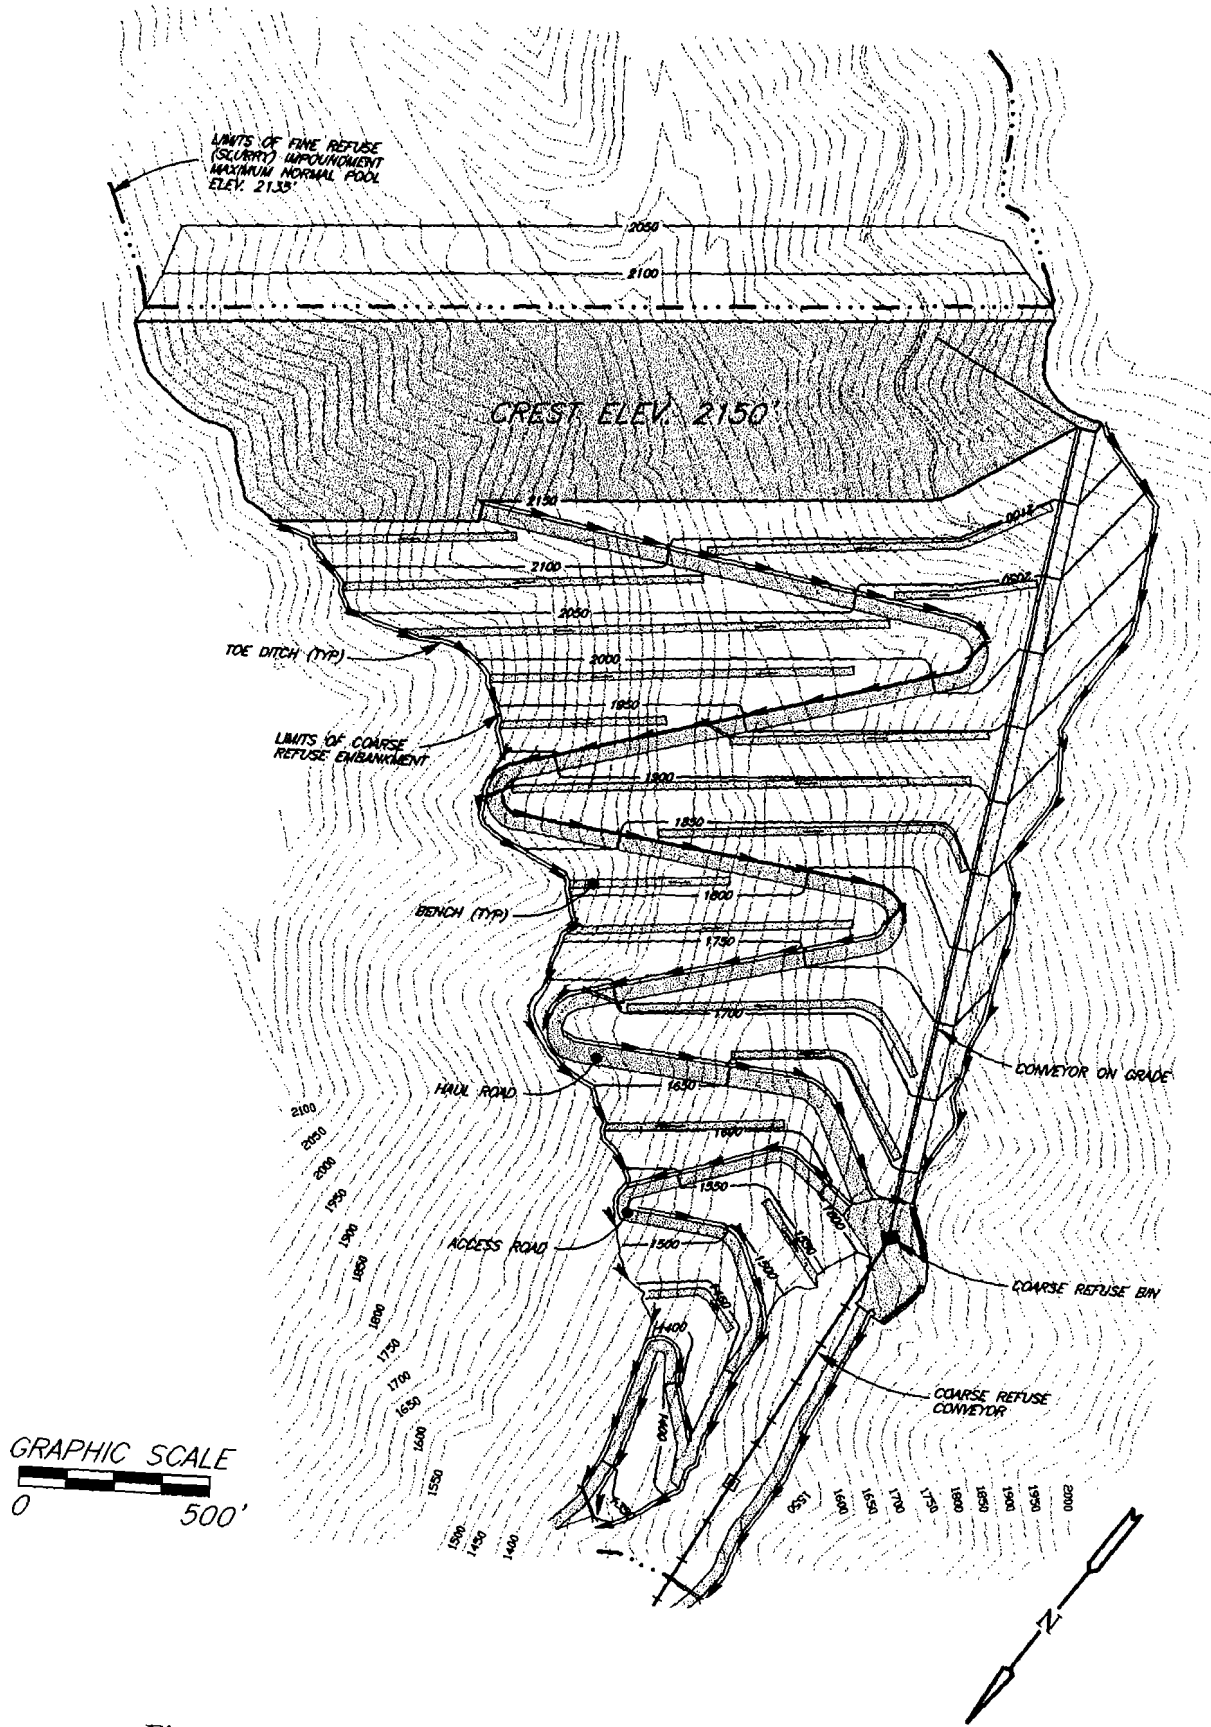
Plan View of a Coal Refuse Disposal Impoundment
